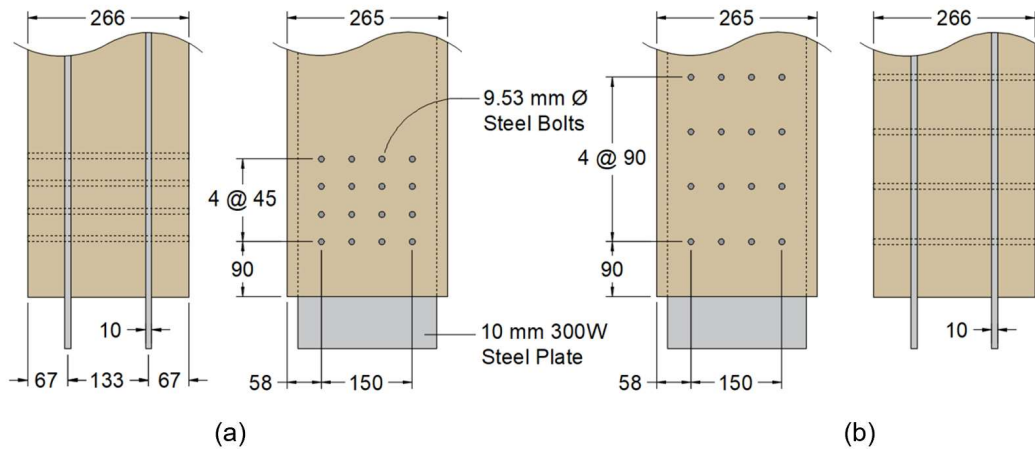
Connection configurations (units in mm): (a) C-45; (b) C-90.
